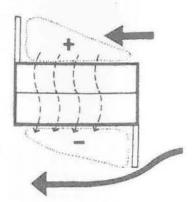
Wing walls to generate cross ventilation with 90° wind
